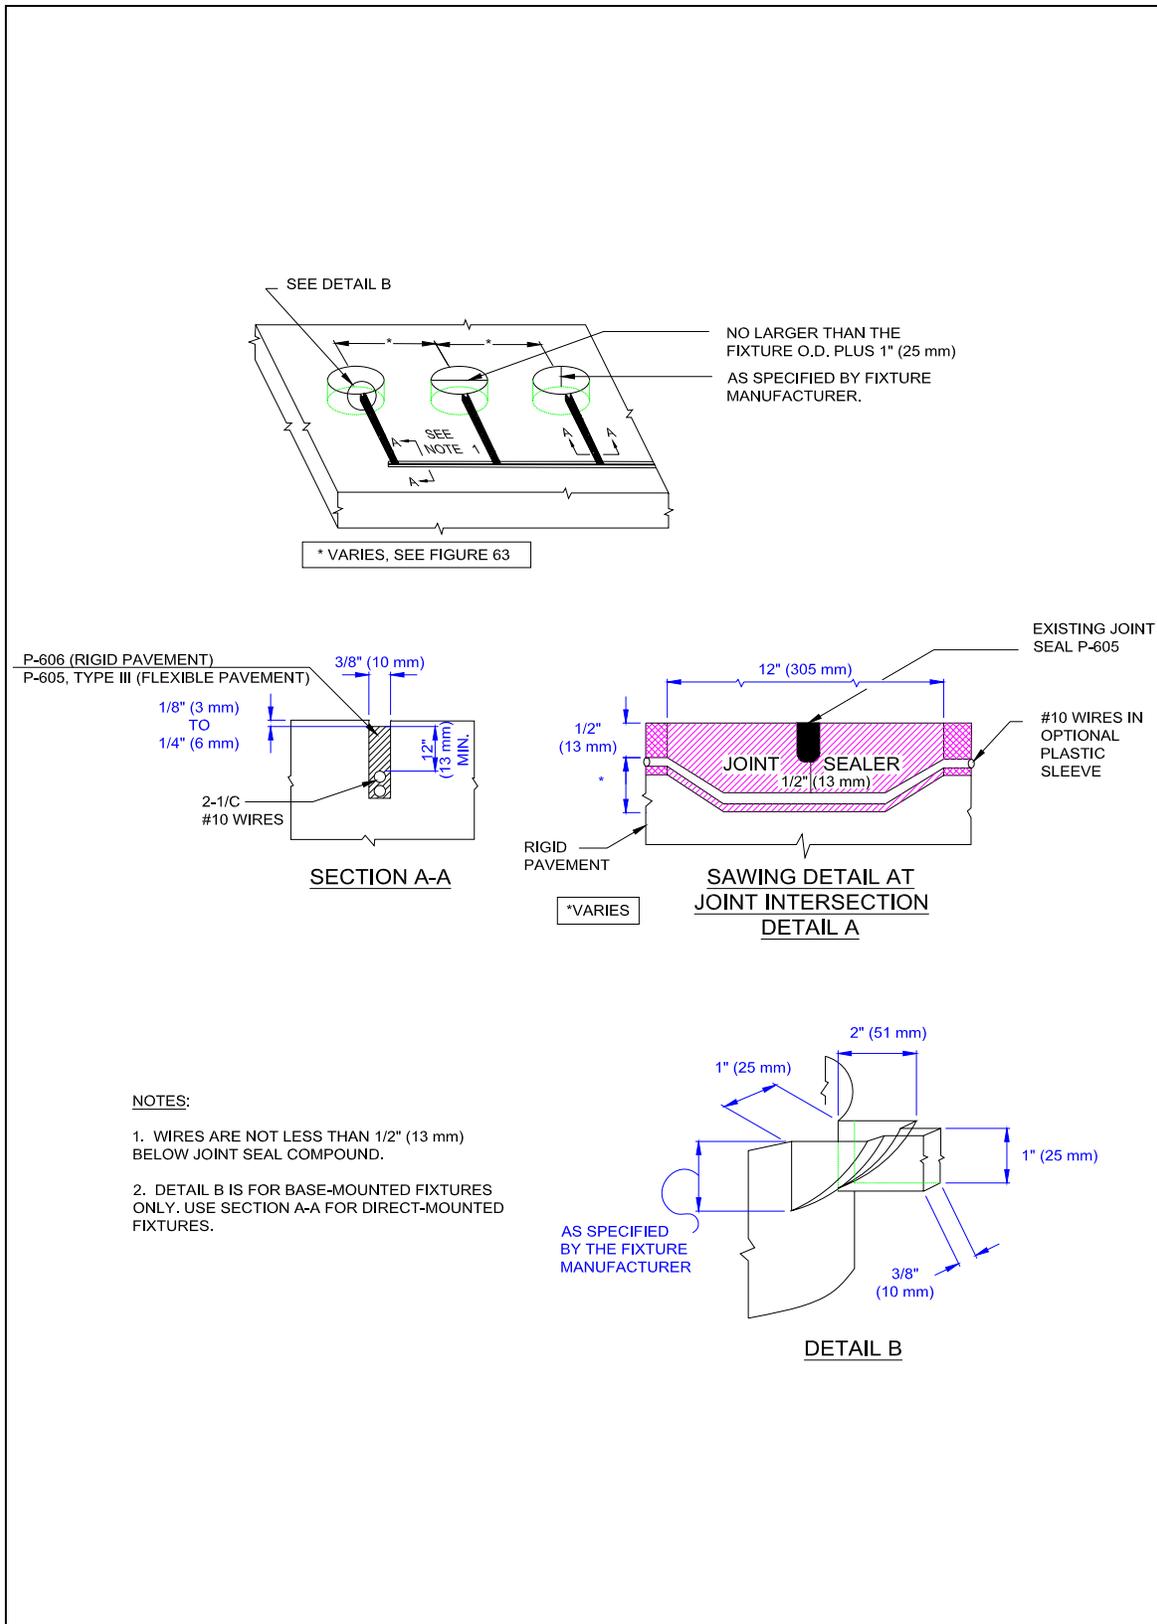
Sawing & Drilling Details for In-pavement Land & Hold Short Lights.
